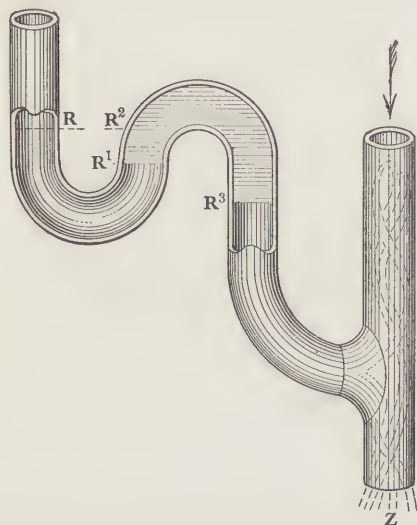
SYPHONAGE FROM A FIXTURE DISCHARGING THROUGH THE RECEIVING STACK
